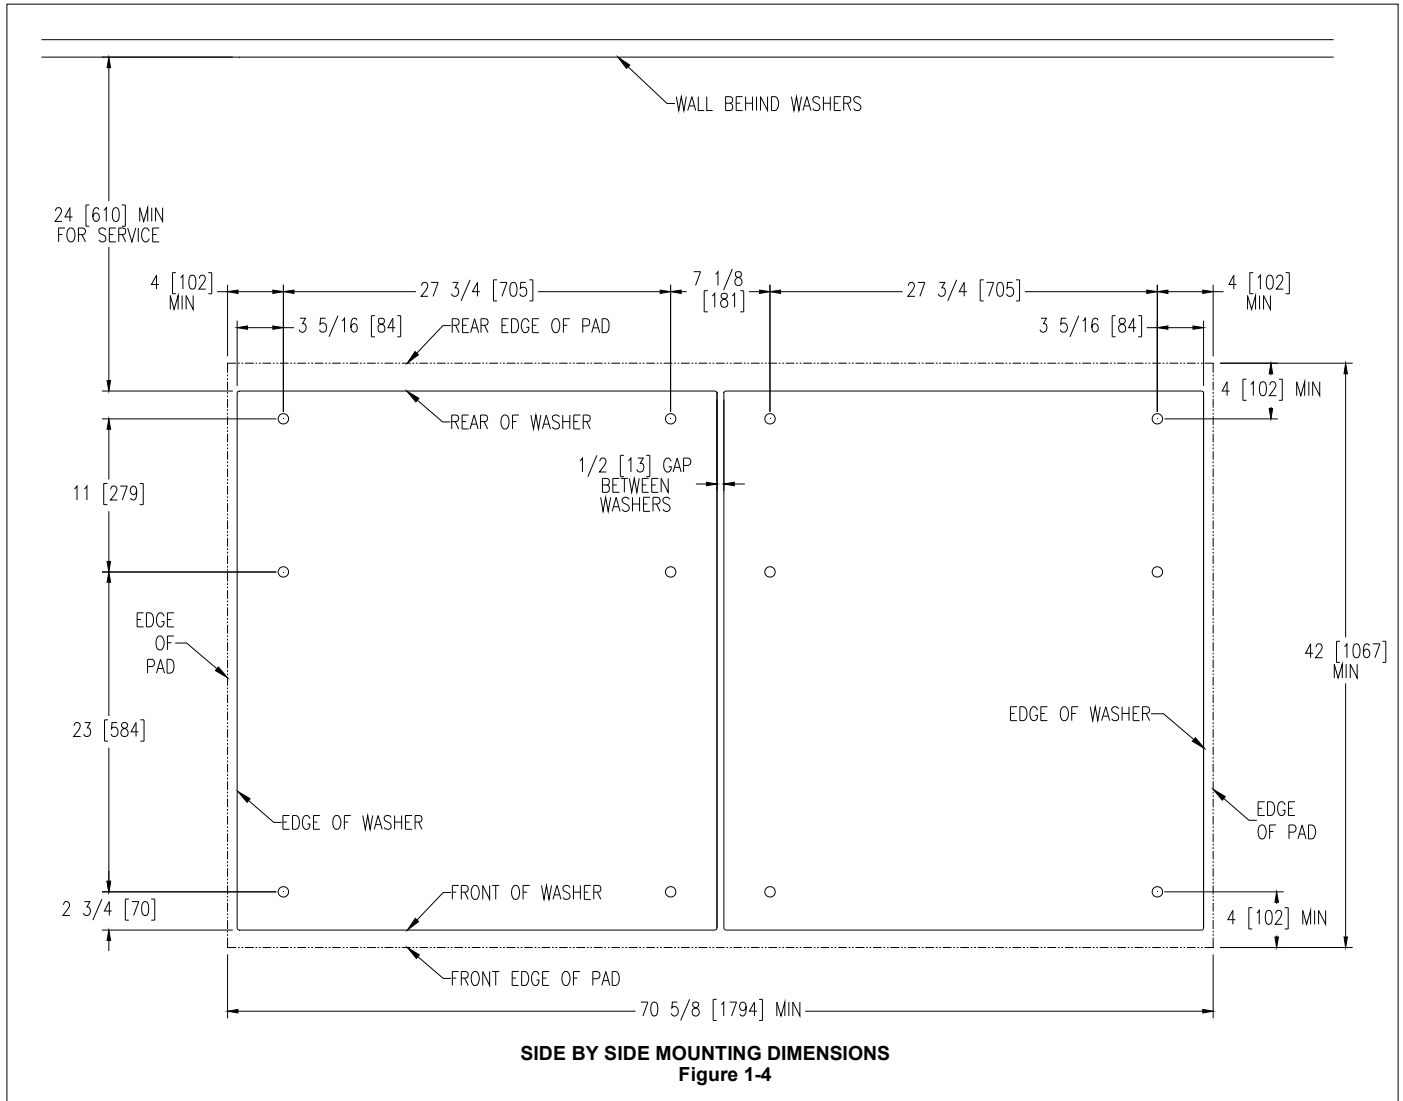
T-900 Machine Side By Side Mounting Detail
